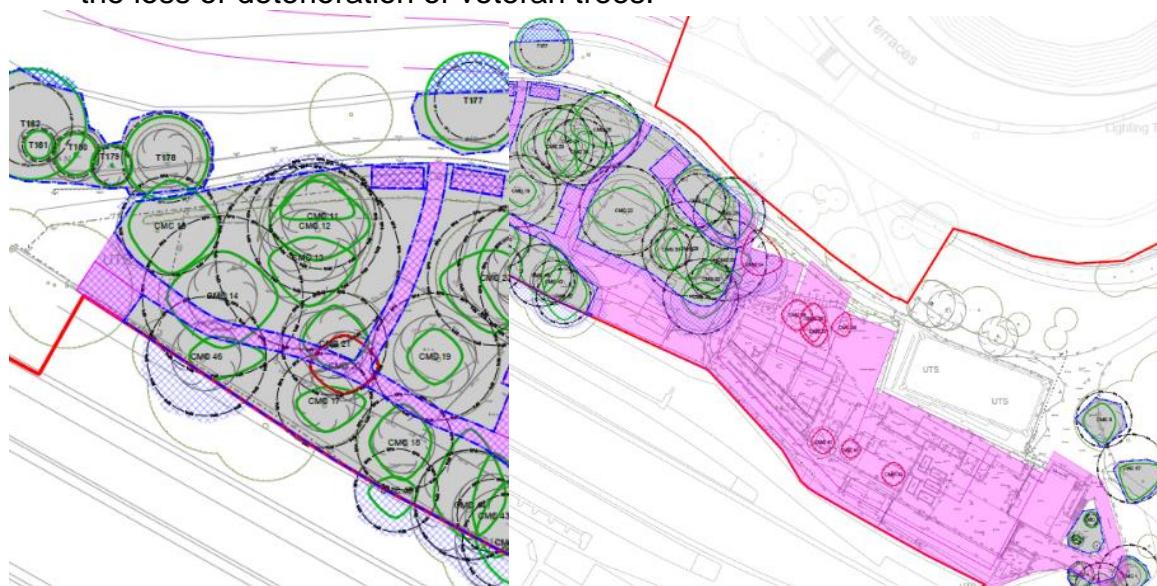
Tree protection plan – veteran trees at Capel Manor college site (source: AECOM)
